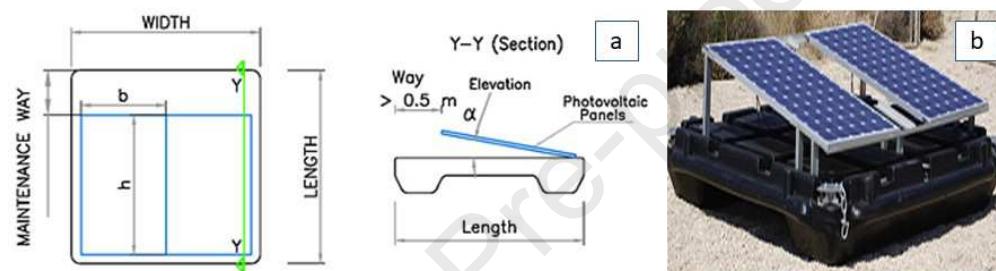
a) The layout of a typical floating PV module (Redón Santafé et al., 2014), b) Photo of a FPV module (Ferrer-Gisbert et al., 2013).
